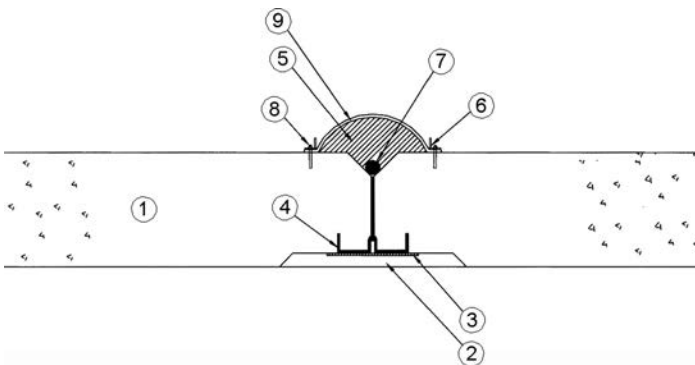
Typical special waterstop structure of vertical compression/tension slab joint used at some very high Chinese CFRDs. (1) Face slab; (2) cement mortar; (3) rubber cushion; (4) "W" shape copper waterstop; (5) mastic, called GB filler; (6) rubber rod; (7) "L" steel profile; (8) expansion bolts; (9) resistant cover material manufactured with EPDM.
